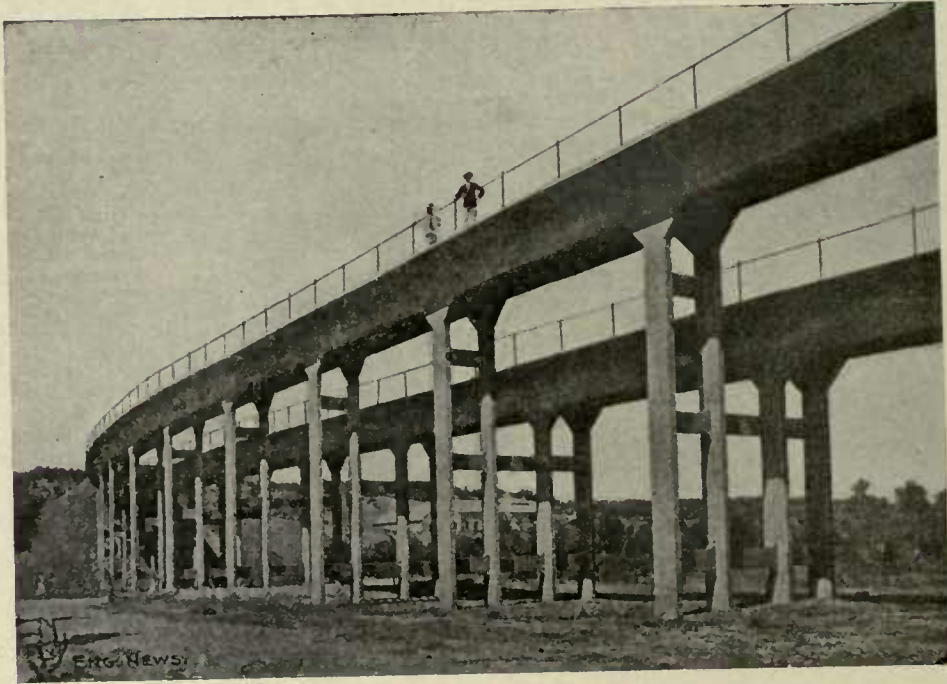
VIADUCT AND ORE-LOADING PIER OF REINFORCED CONCRETE CONSTRUCTION.
